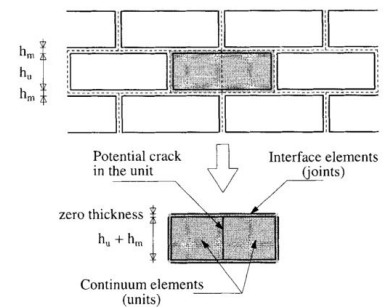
Discrete modelling of masonry. Bricks as elastic elements and mortar and potential brick crack lines as interface elements, (Lourenco and Rots, 1997).
